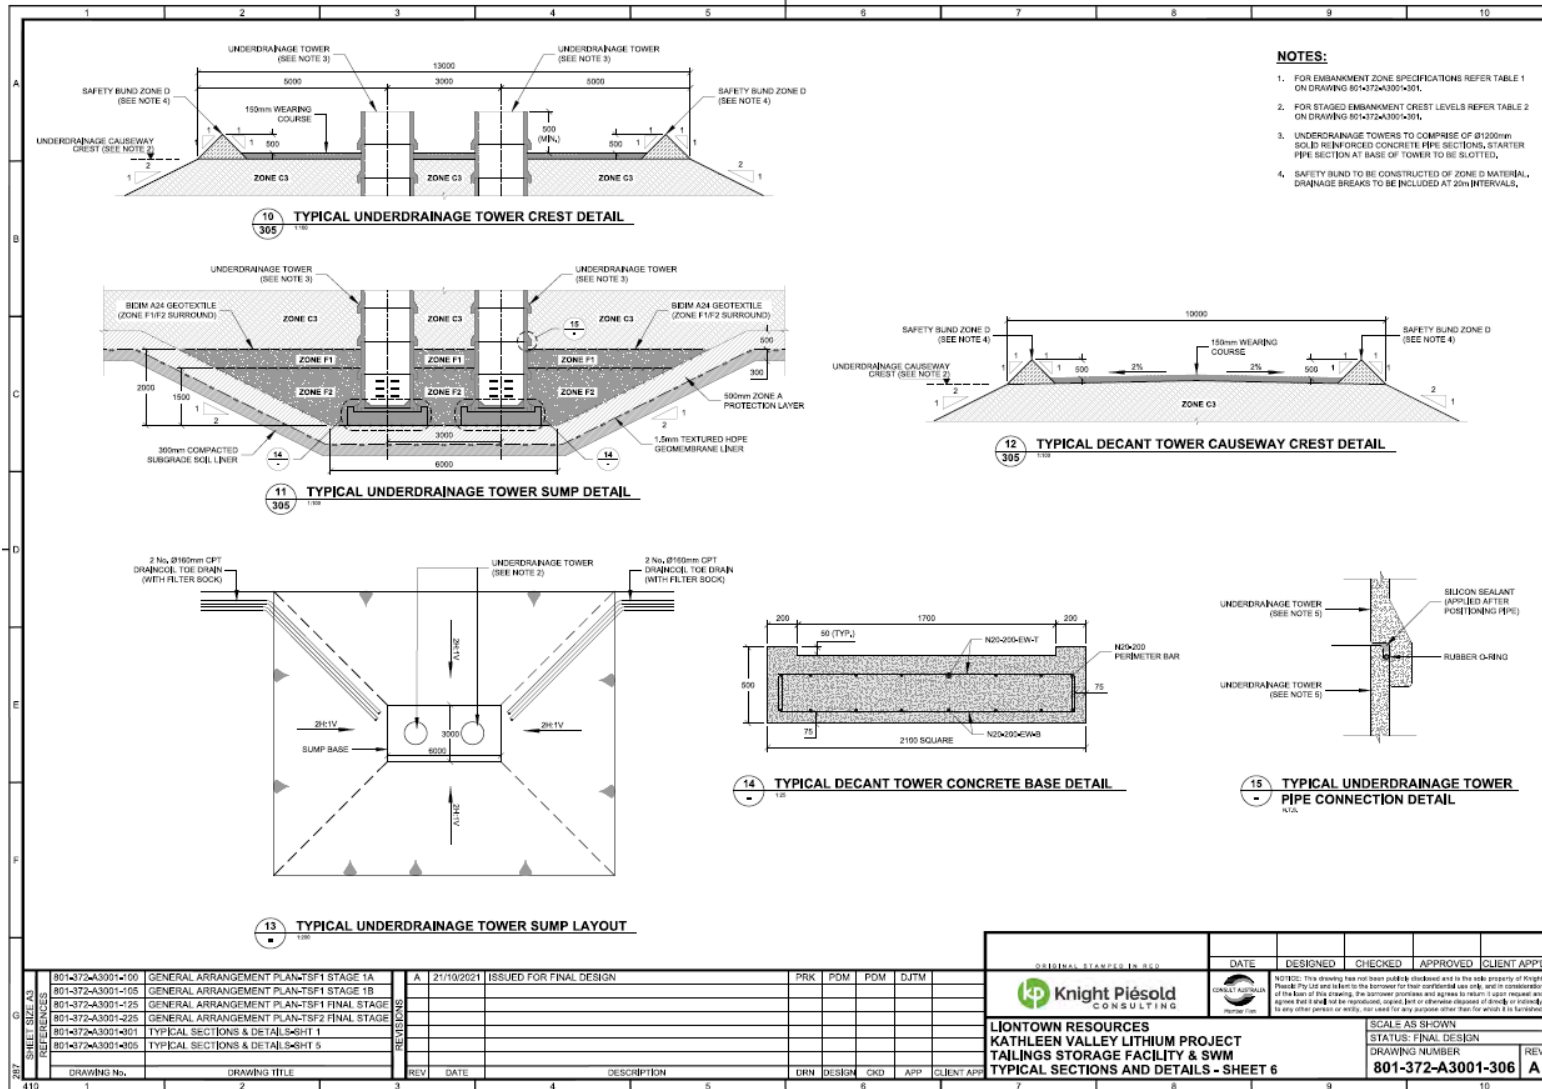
Tailings Storage Facility Section Detail, Underdrainage – 801-372-A3001-306
